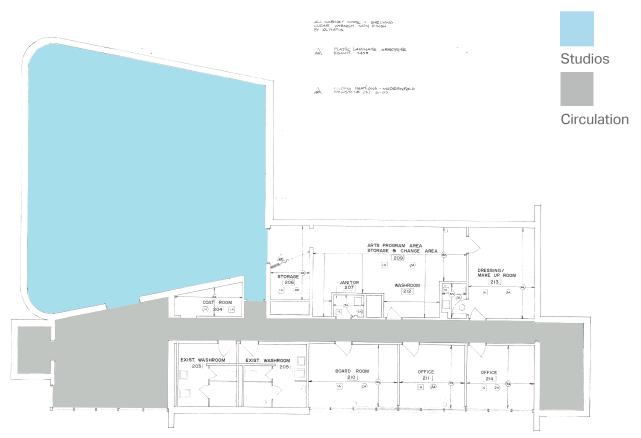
Graphic Overlay of Second Floor Plan Image created by Giaimo Architects
